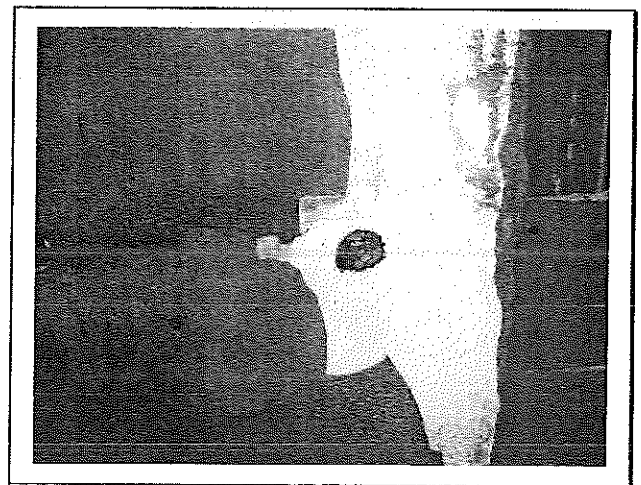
Viewing 12"x 12" brown ceiling tile puck, Basement, telephone equipment room.
